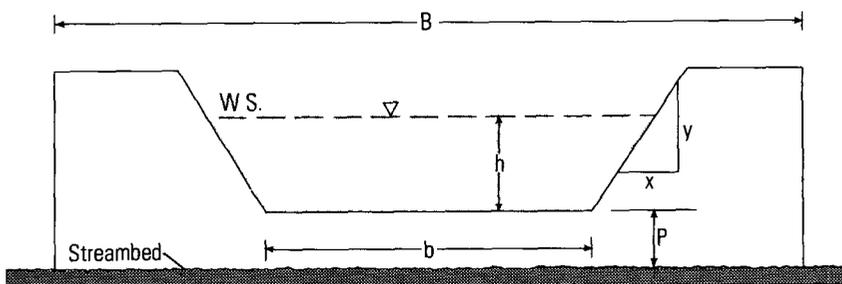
Sketch of upstream face of a trapezoidal weir.
